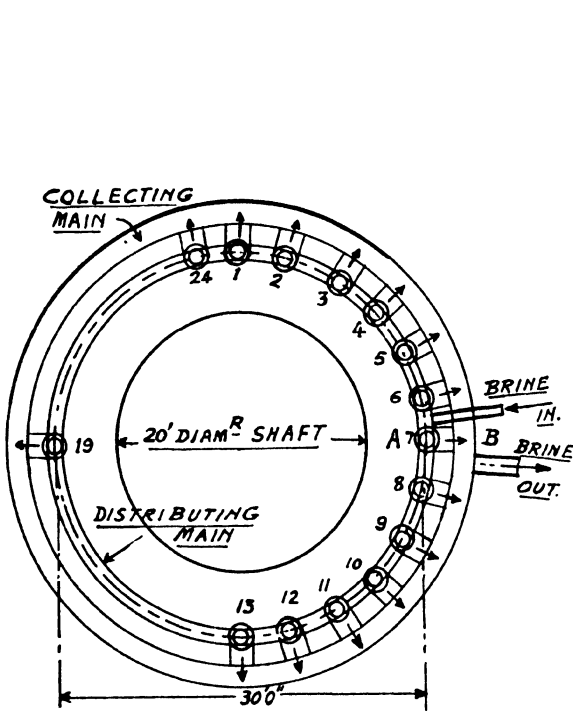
Plan showing Position of Holes and Tubes in Freezing Method of Shaft-sinking.
